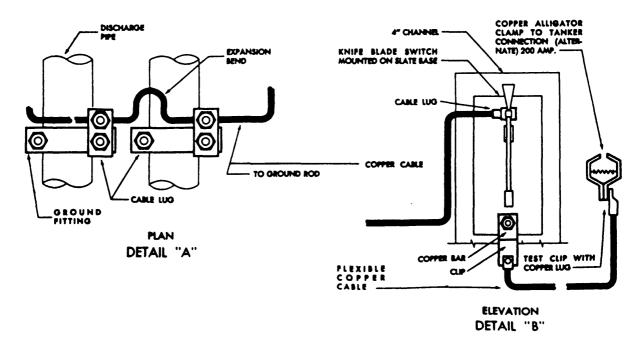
Typical Method of Grounding Pier, Floating, and Barge Facilities.
